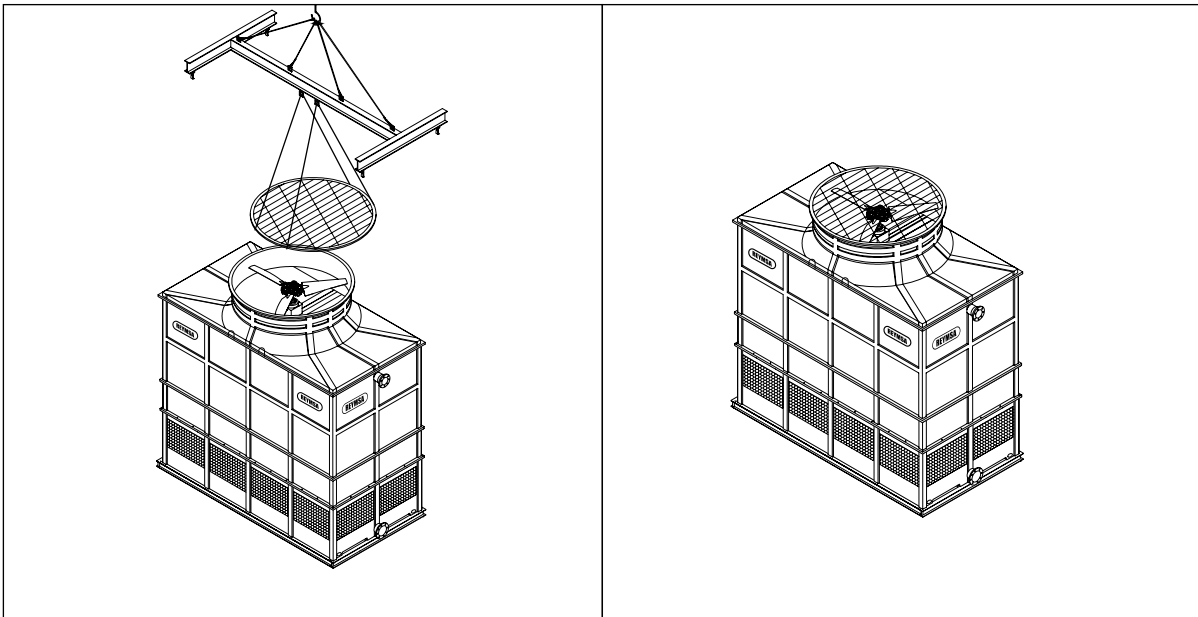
Installation of the Fan guard on RTG and RTGTC model towers.
